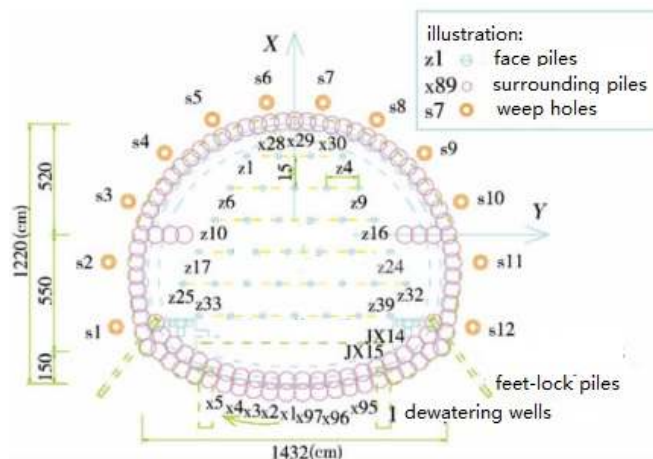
The cross section of taoshuping tunnel with advanced reinforcement support
